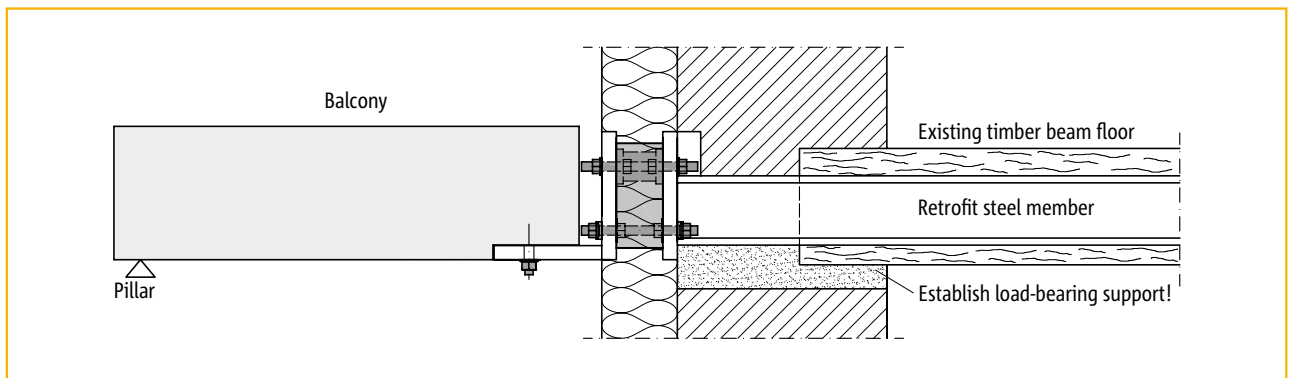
Balcony supported, connected with type KST on timber balcony floor (concrete prefabricated component)
